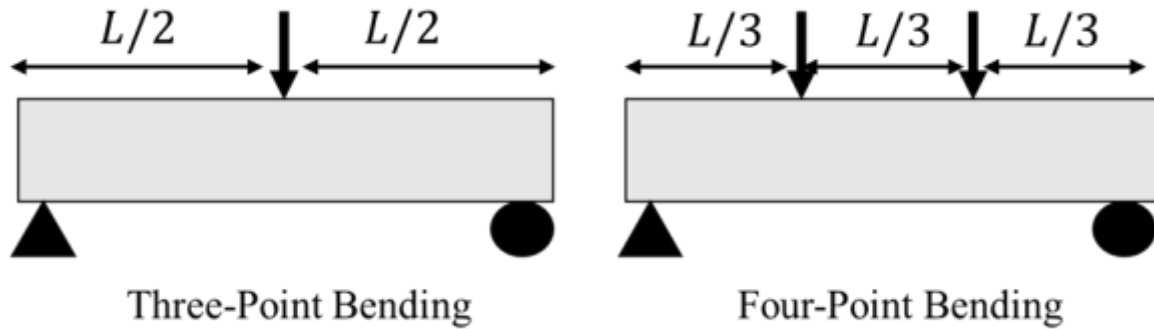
Loading types for concrete beam fatigue studies (L refers to the beam span).
